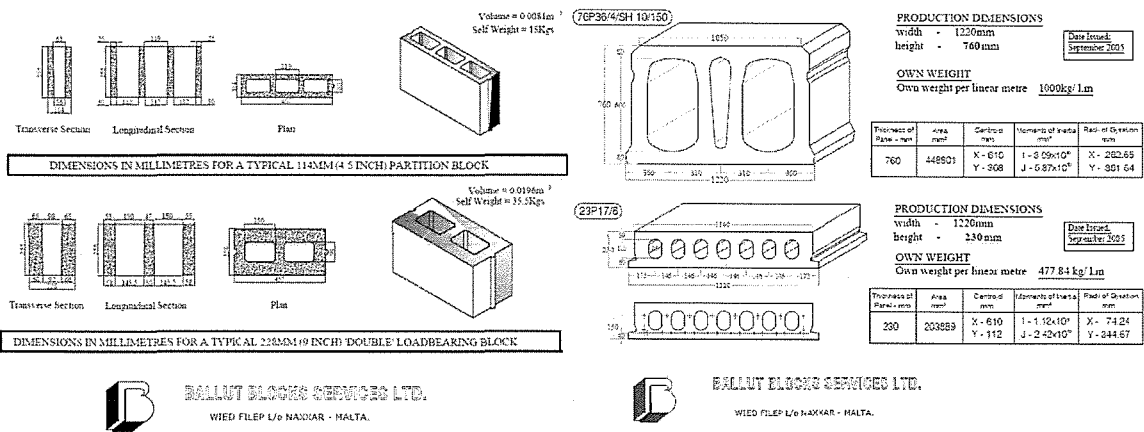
Typical local concrete construction elements of minimum and maximum concrete densities. Source: <http://www.ballutblocks.com/index.html>
